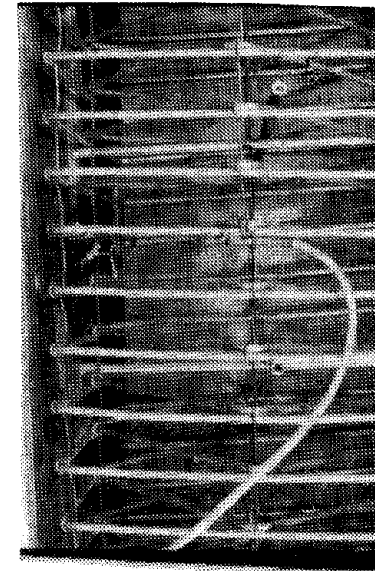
A CLOSE-UP OF SPECIMEN (SQUARE CROSS SECTION)
